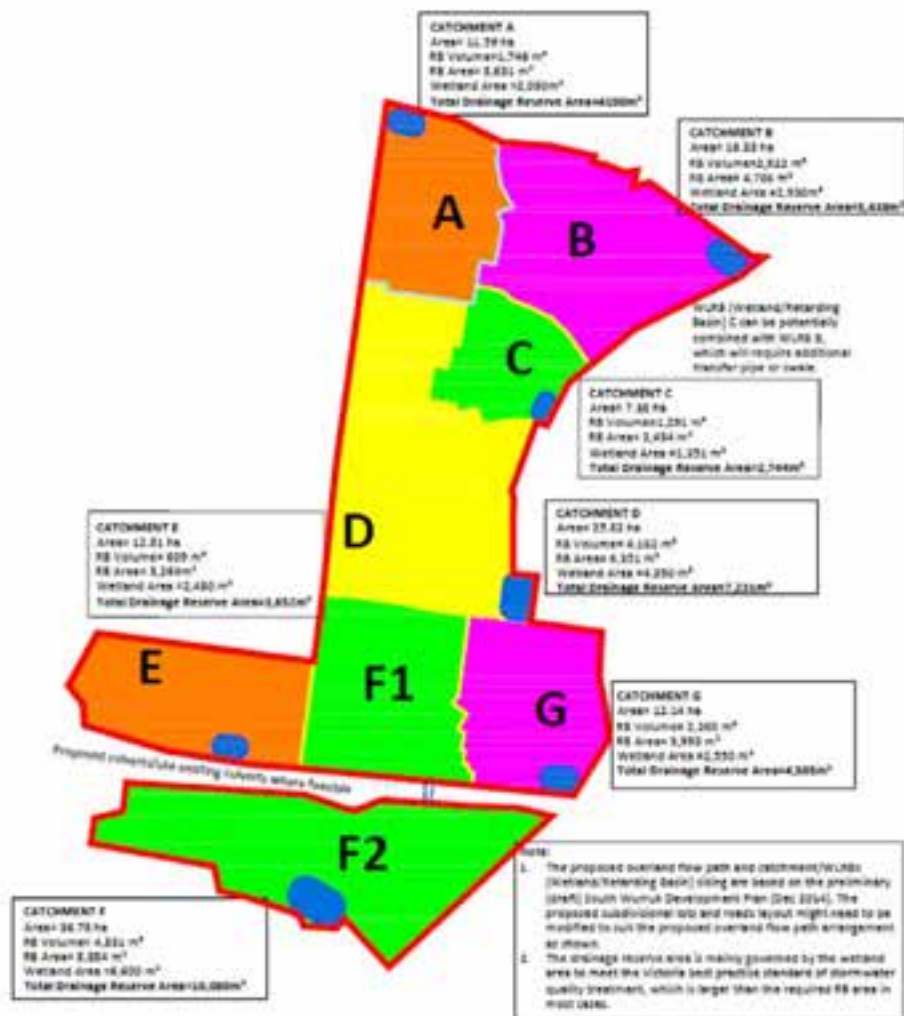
Concept Stormwater Management Plan for South Wurruk Development Plan (Not to Scale)
